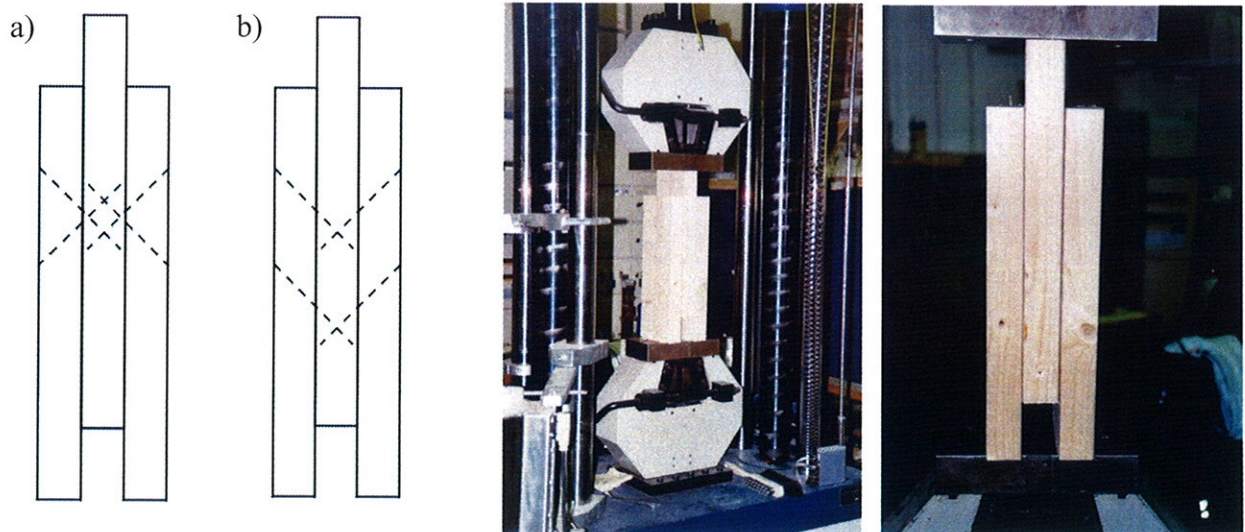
Type of test specimens and compression test set-up. a) a cross screw joint and b) a tension screw joint.
